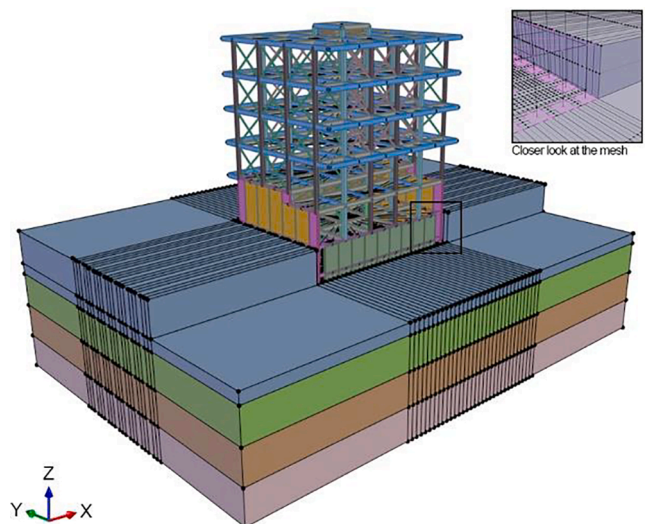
3D modelling of the entire system: soil + foundation + structure.
